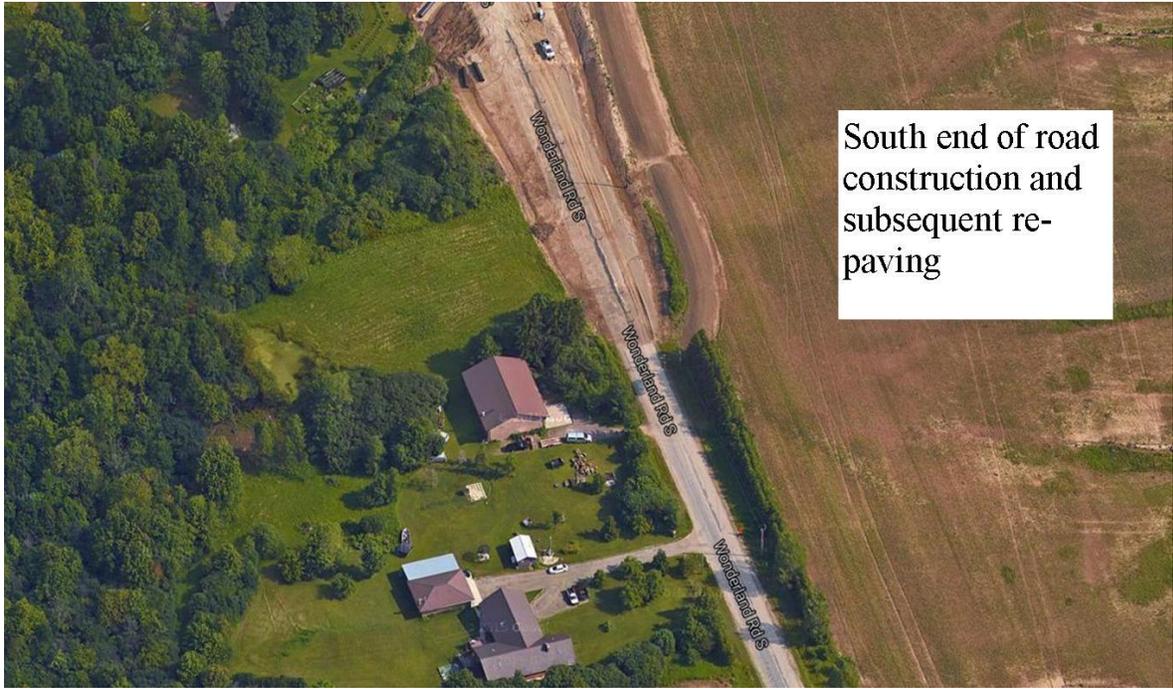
View of the south end of the construction zone on Wonderland Road, south of Highway 401 where the new construction terminated and the aged road surface remained further to the south.
